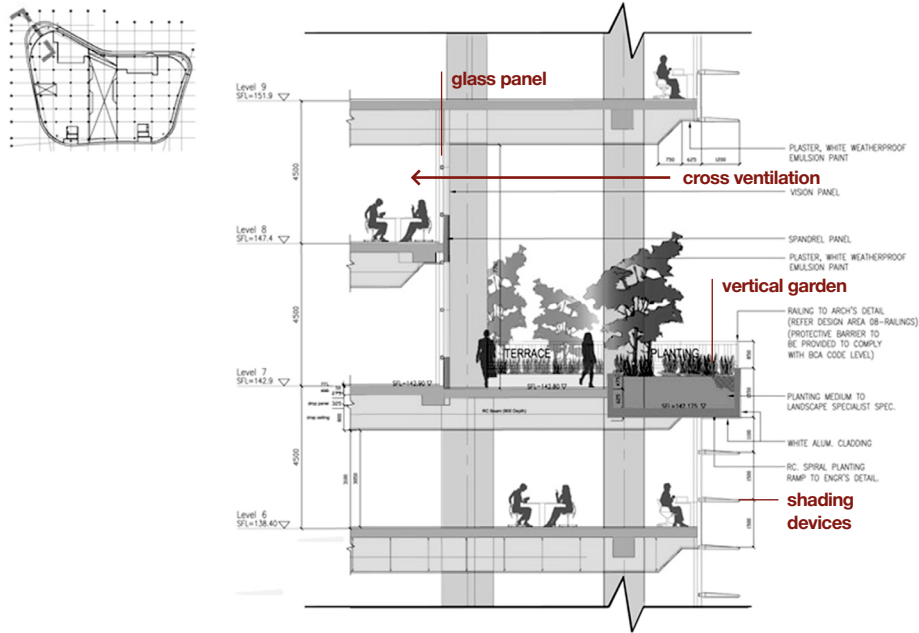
Detailed section of the Solaris building. Source: T.R. Hamzah & Yeang, 2014.
